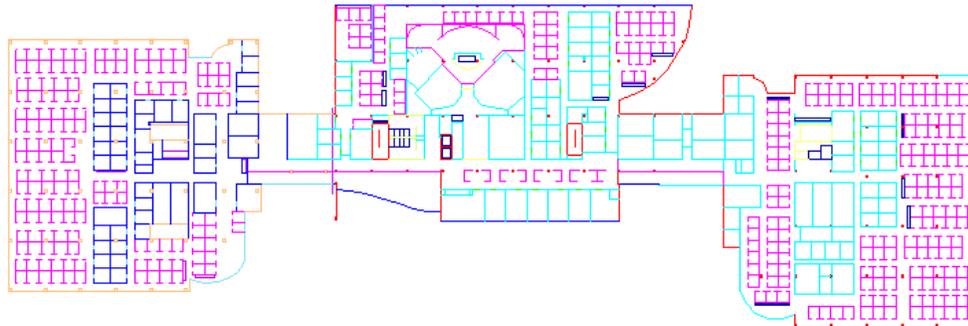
Third Floor Plan for the Mt. Airy Office
